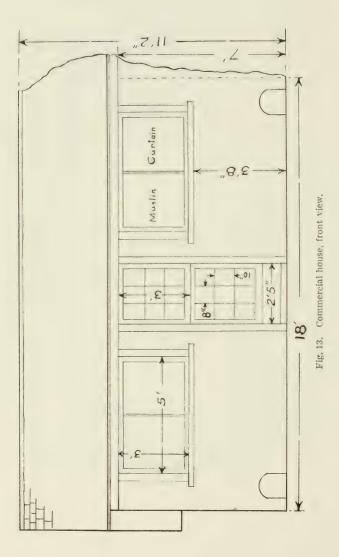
, 13 and 14 (see Fig. 1) are drawings of a single section of the long laying house at the college, each section being 18 feet square thus accommodating 65 birds. The sills are made of two 2x6-inch pieces and the plates of two 2x4-inch. The front is 7 feet 8 inches high and the back 4 feet 8 inches, the studs are 7 feet and 4 feet long respectively. The roof is of combination type and being comparatively steep having 1 foot rise to every two feet horizontal run. Shingles are used instead of prepared roofing, being better adapted to the steeper roof. No alleyway is used in this house and the pens are connected by a series of doors thus utilizing all the space and compelling the attendant to mingle with the birds where he is able to study their needs and conditions much more thoroughly.
